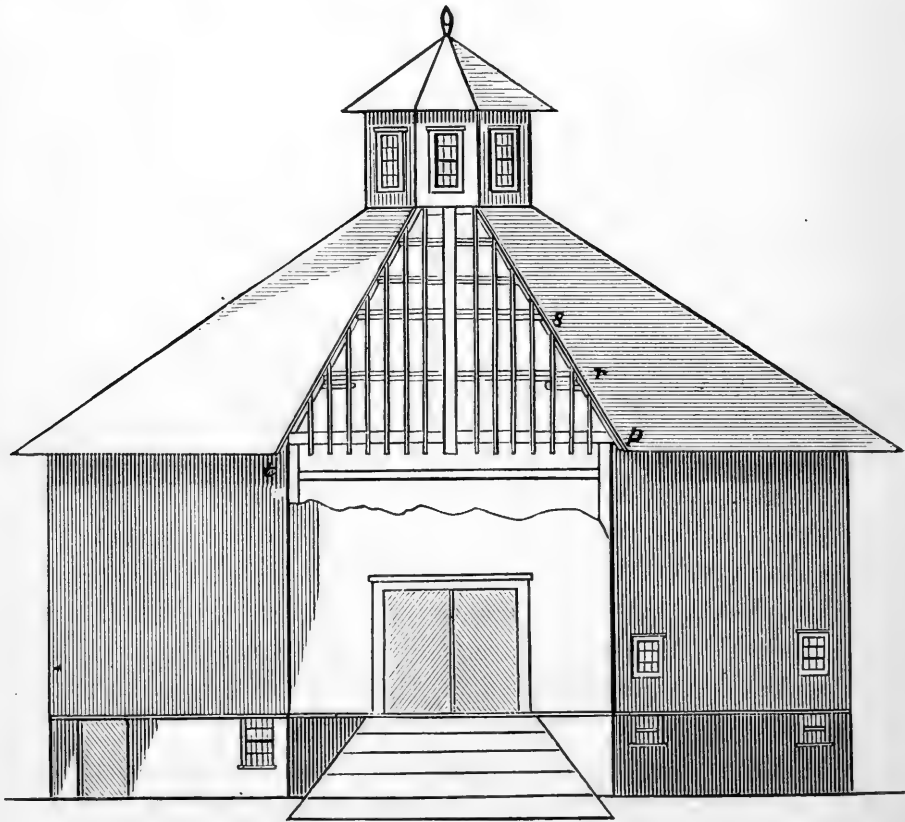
OCTAGON BARN (NORTH ELEVATION).
